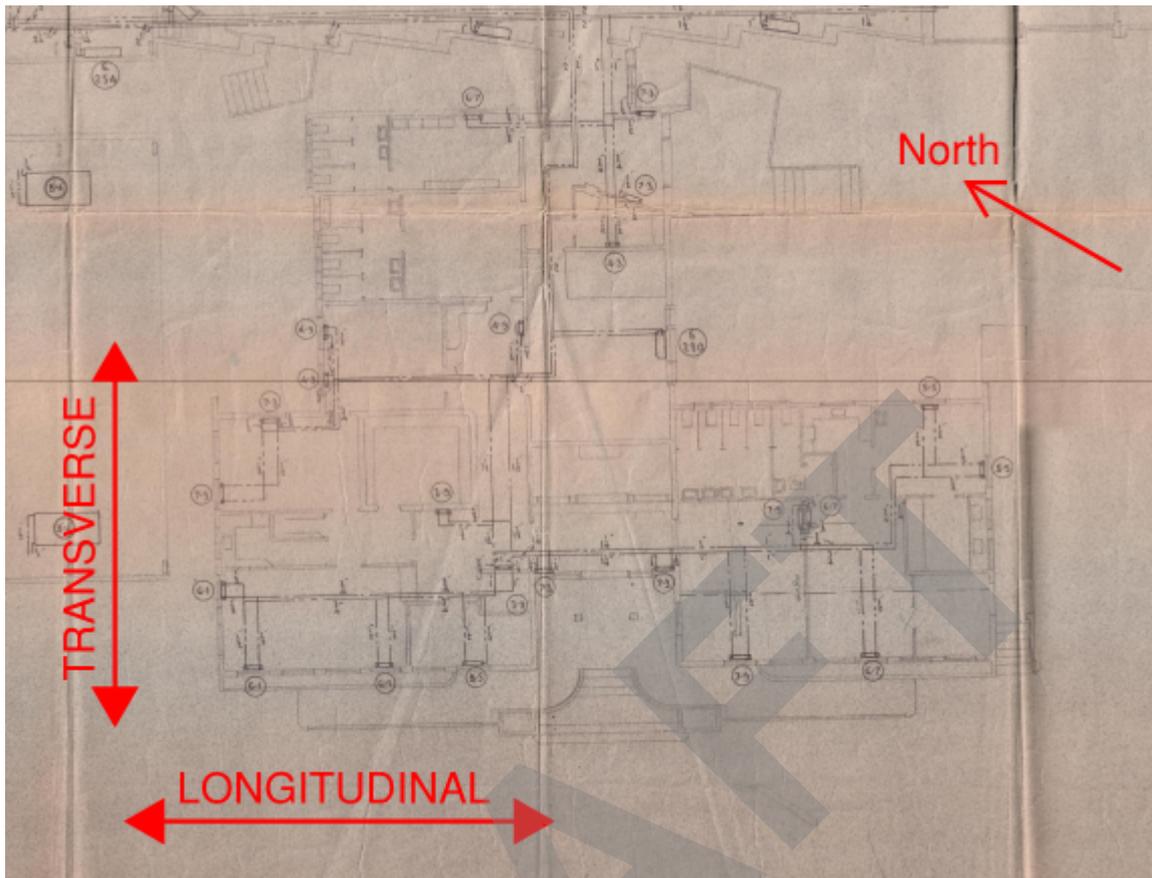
Balclutha Information and Service Centre, Floor Plan
